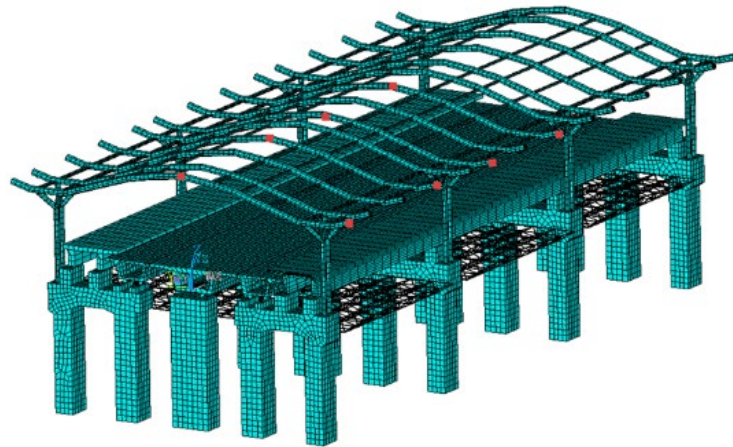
High-speed railway station of “integrated bridge-building structure” and measuring point layout
